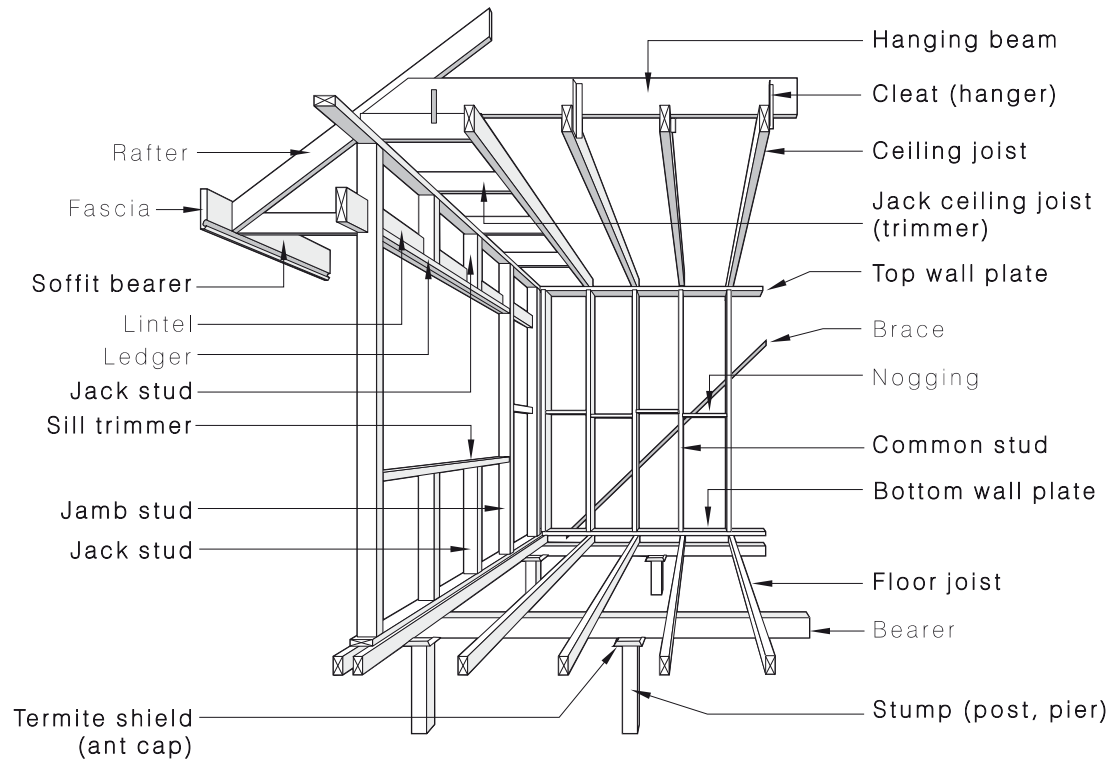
Typical arrangement of timber framing, Source: AS1684.3
